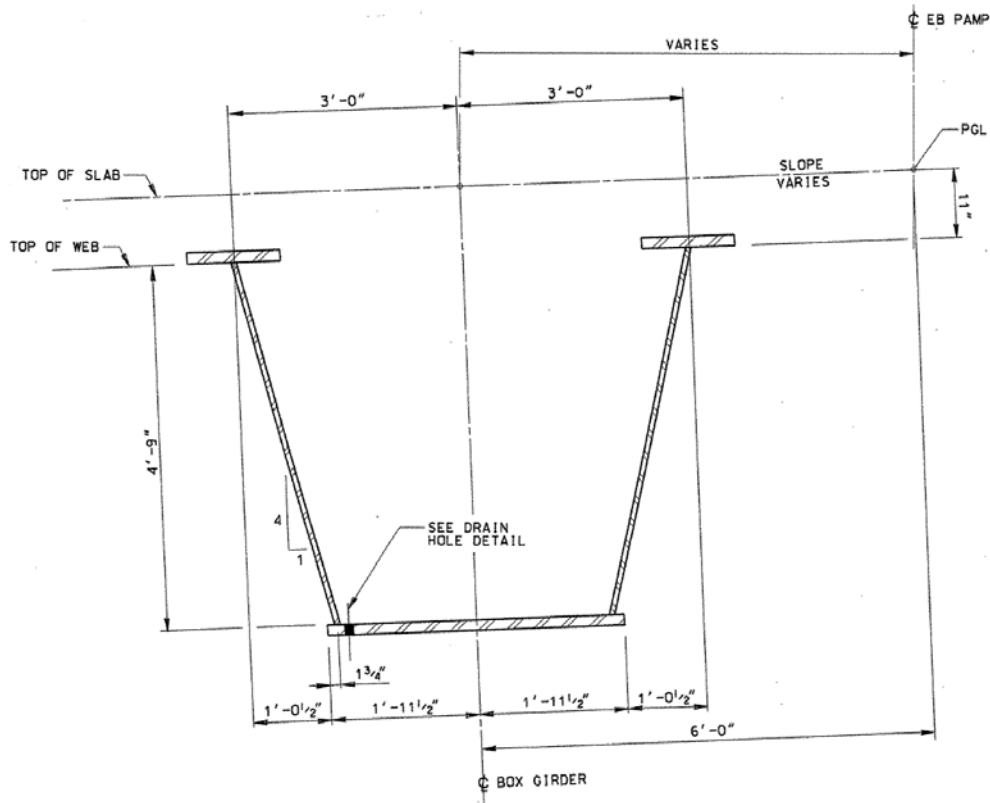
Elevation View of Tub Girder (TxDOT 1996).
